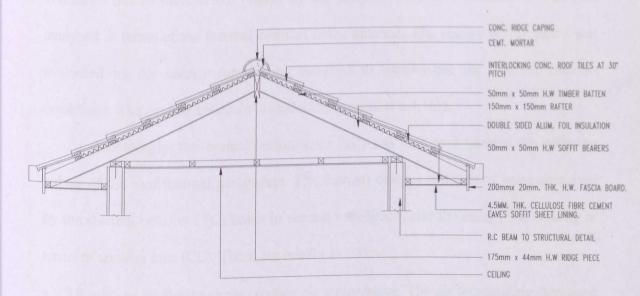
Roof detailing of PWD-NQD (Malaysia, 2002e)
